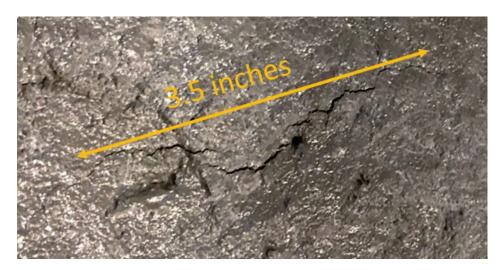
Plastic Shrinkage Crack During Formwork Trials
